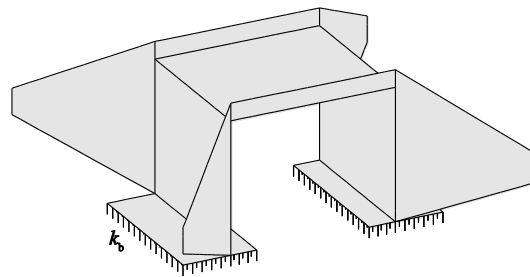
3D shell model of a portal frame bridge, accounting for foundation support stiffness.
